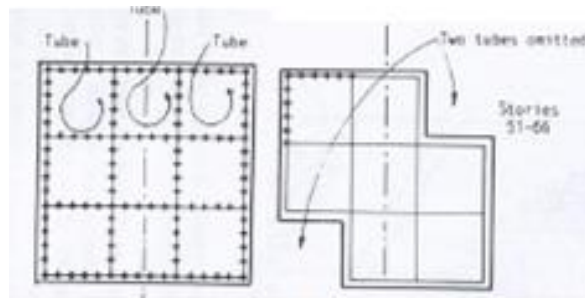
Bundled tube different possible floor plans (adapted from [1])
